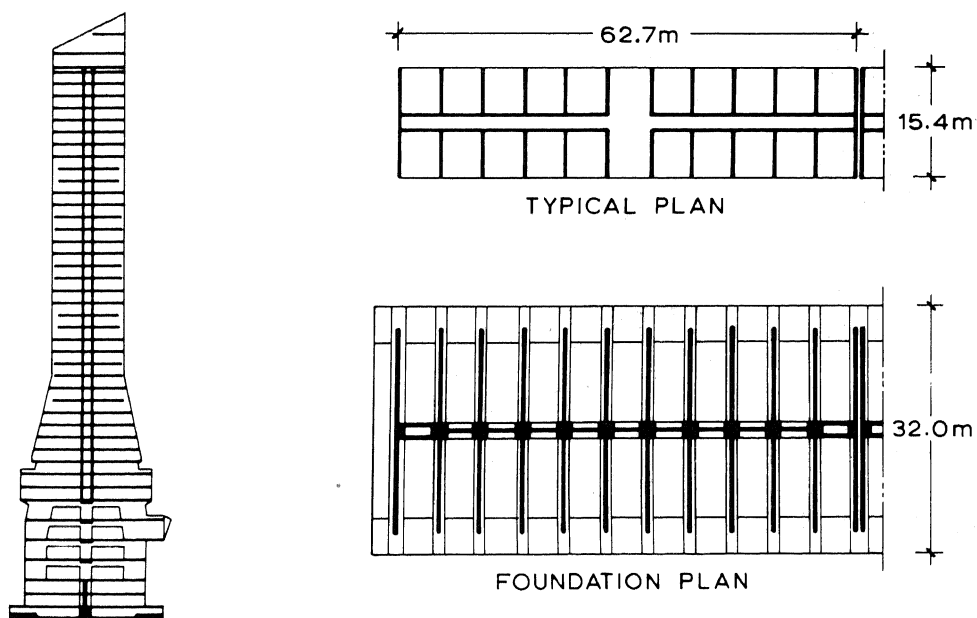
Elevation, typical plan and foundation plan of the buildings.
